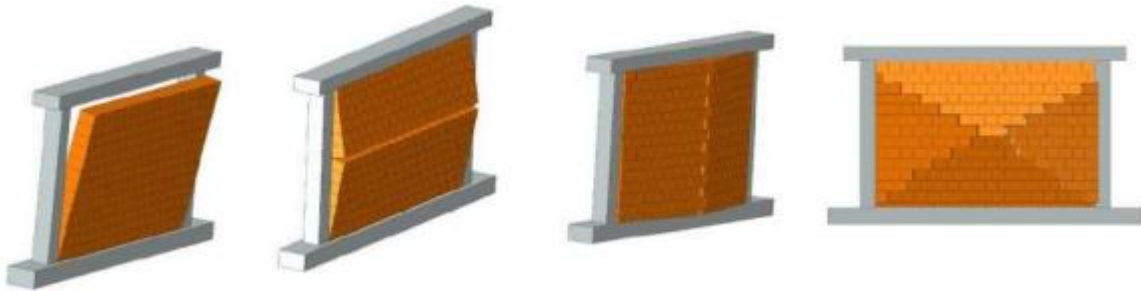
Out-of-plane failure modes of masonry infill
